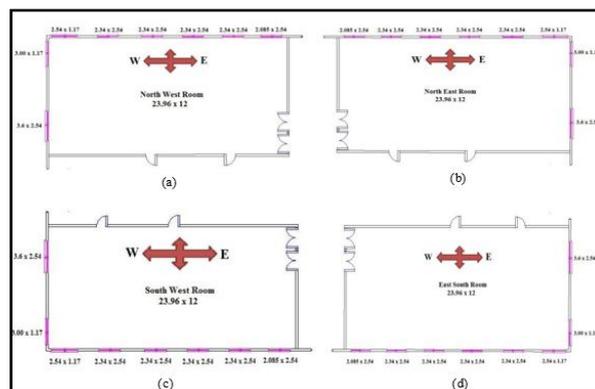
Dimensions of fenestrations (a) north west room (b) north east room (c) south west room (d) south east room
